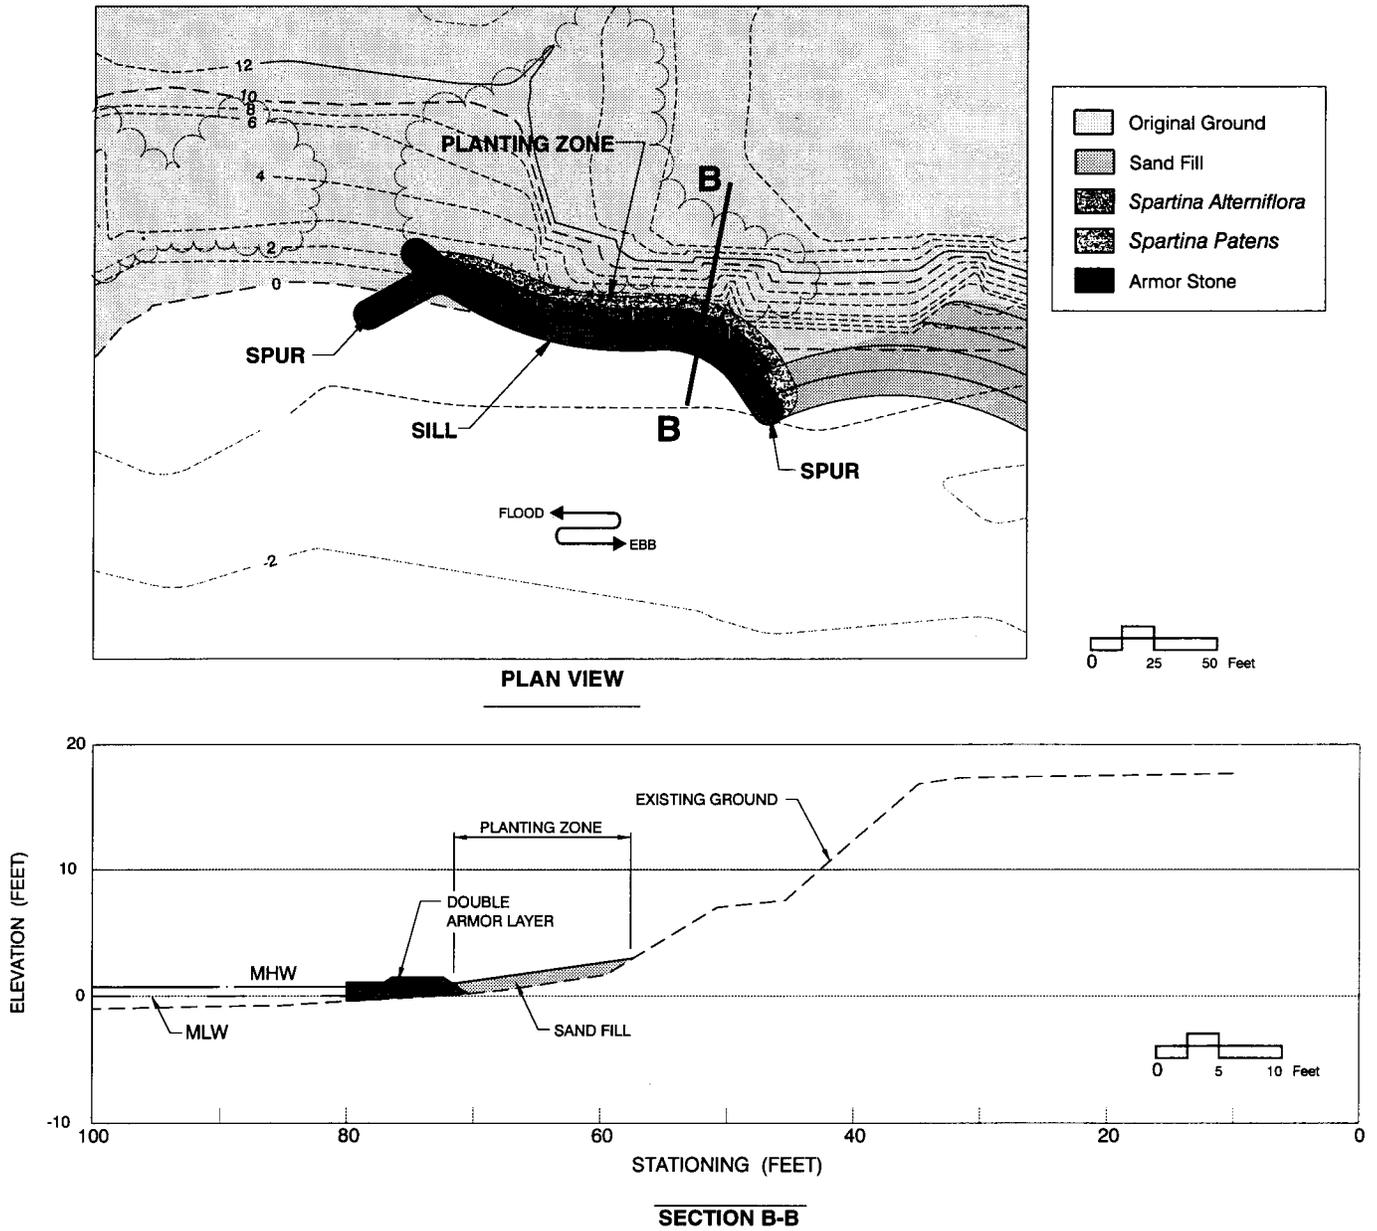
Sill: Typical cross-section and plan view. (After Reynolds and Hardaway, 1995)
